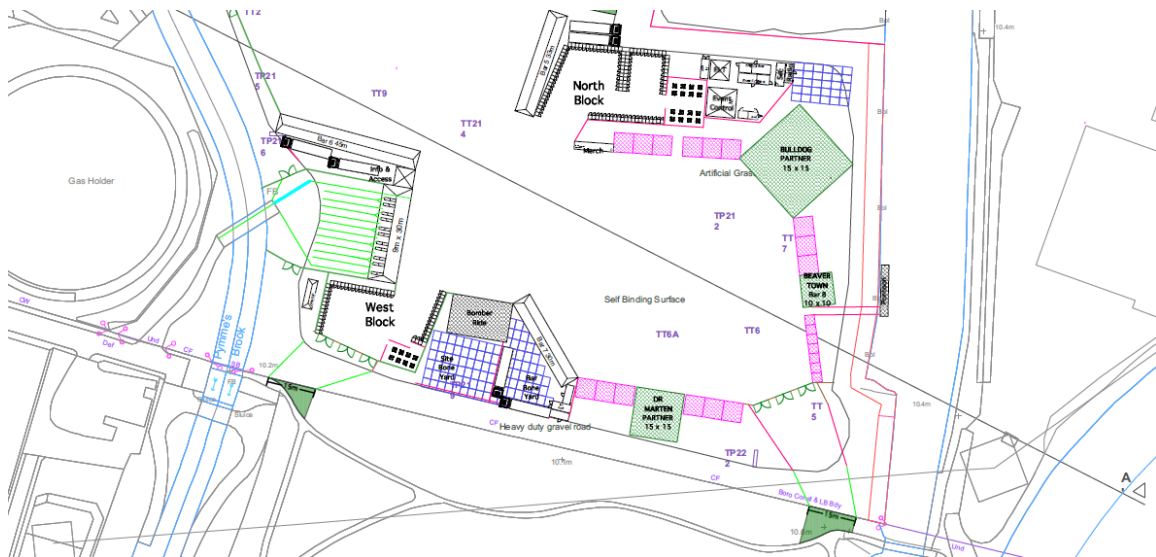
Detailed Site Layout plan showing the entry point into the site from the bridge over Pymmes Brook and the emergency exit points (shaded in green) from the site onto Tottenham Marshes.
